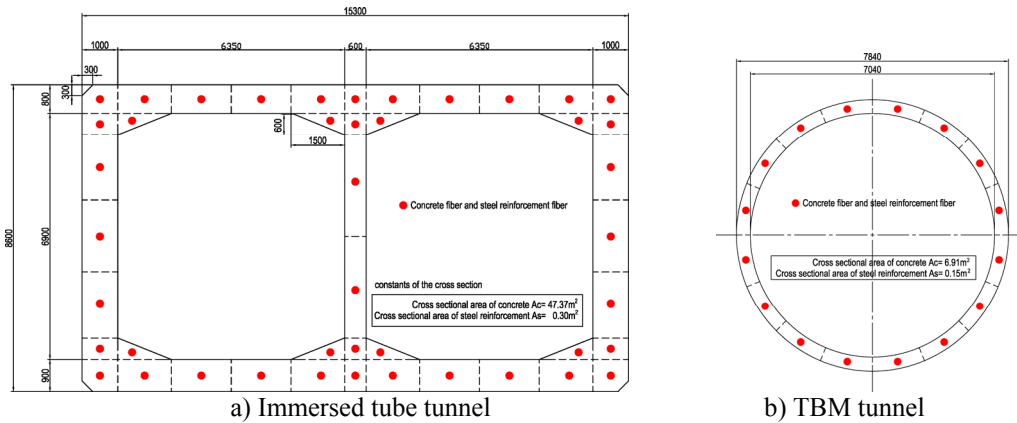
Three-dimensional fiber model of the tunnels divided into elements
